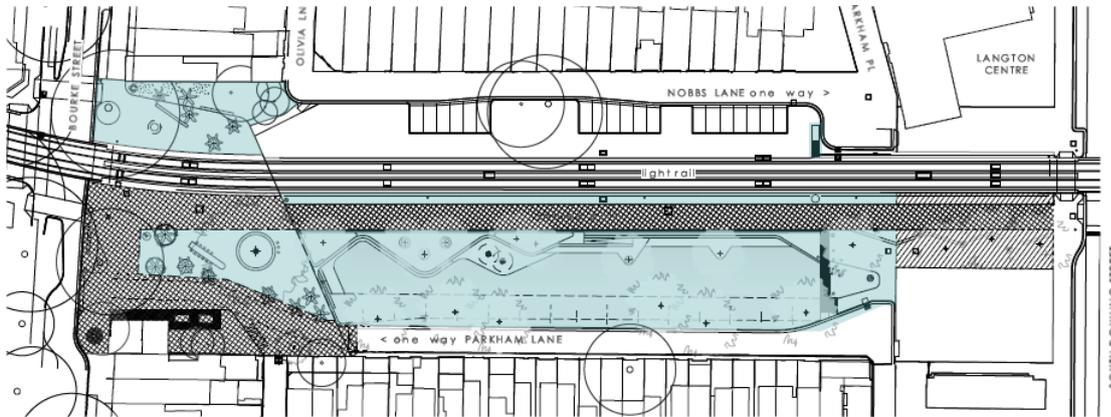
The area of the site identified under Figure 1 to which the works proposed under the subject application are highlighted in blue.
